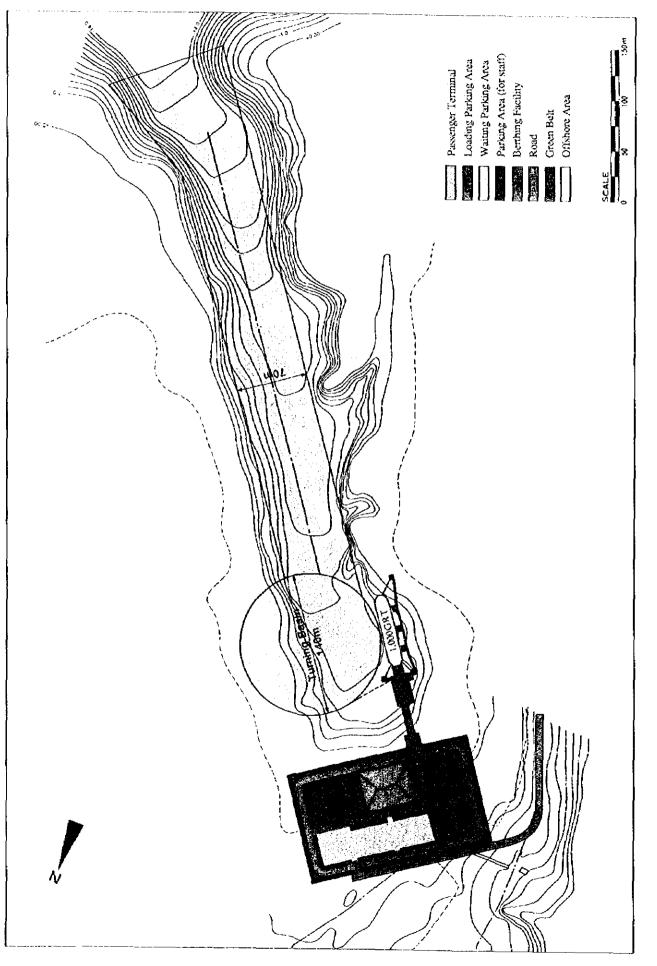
Layout Plan of Banjarmasin Ferry Terminal
